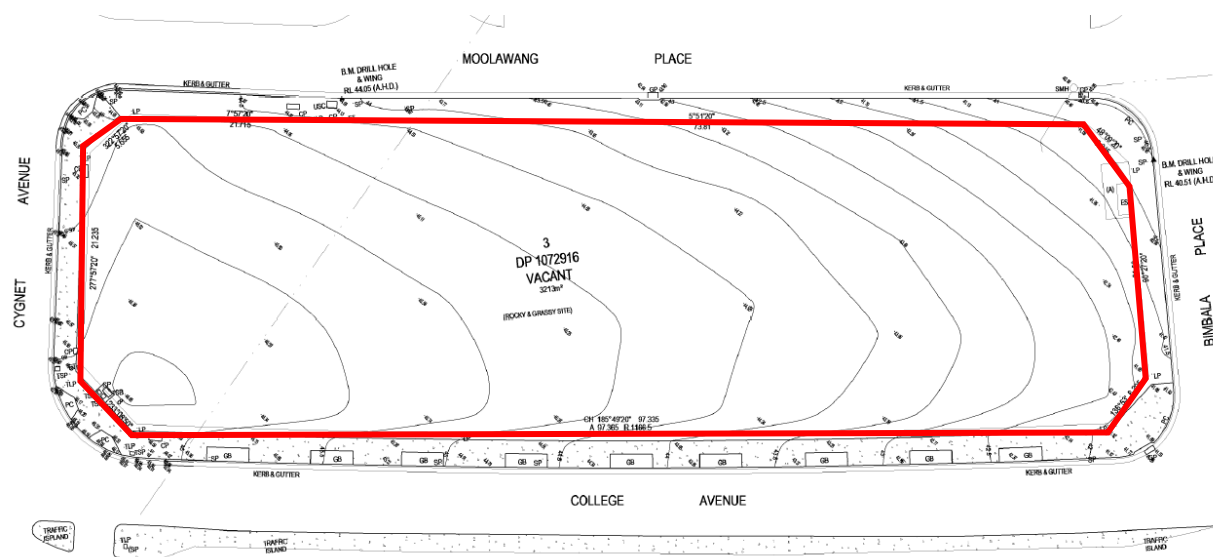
Extract from Site Survey, subject site outlined in red (Source: Landteam Australia Pty Ltd)
